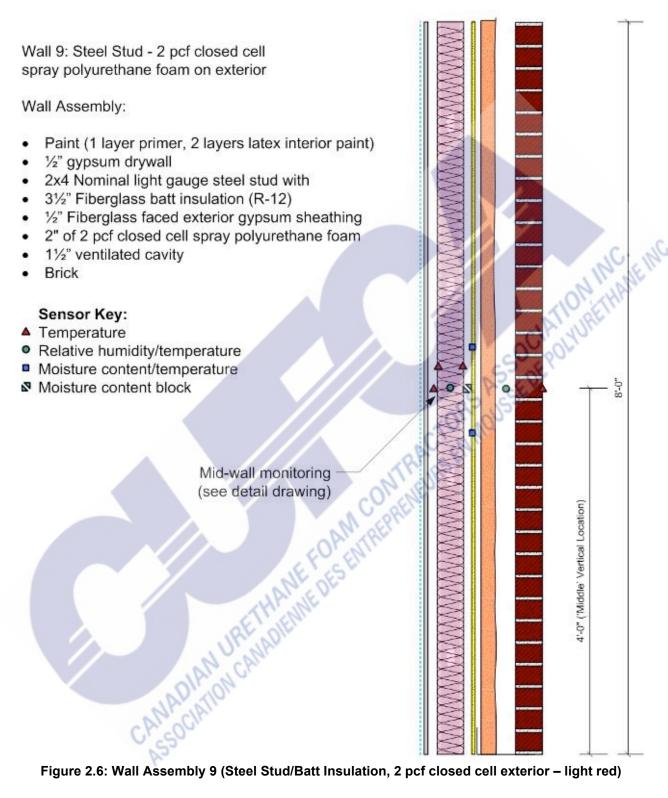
Wall Assembly 9 (Steel Stud/Batt Insulation, 2 pcf closed cell exterior – light red)
